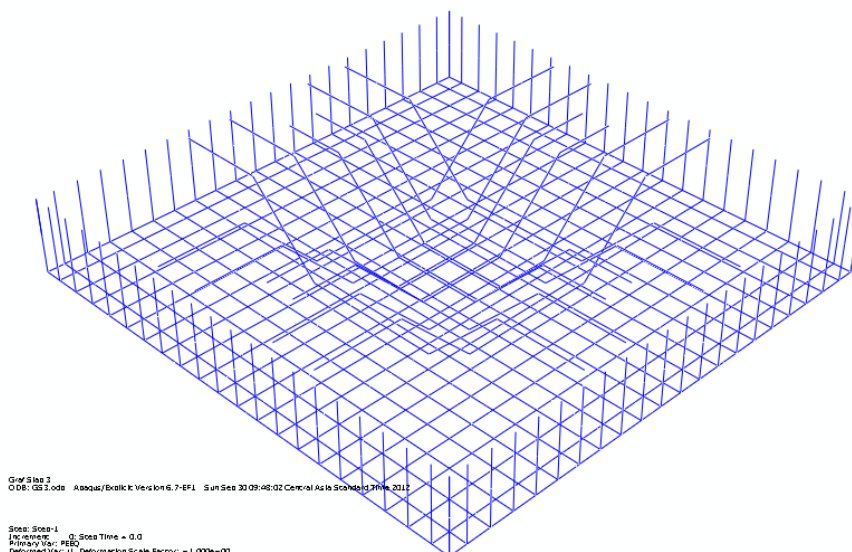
Typical tension and bent bar reinforcement for G-3 and G-4 slabs
